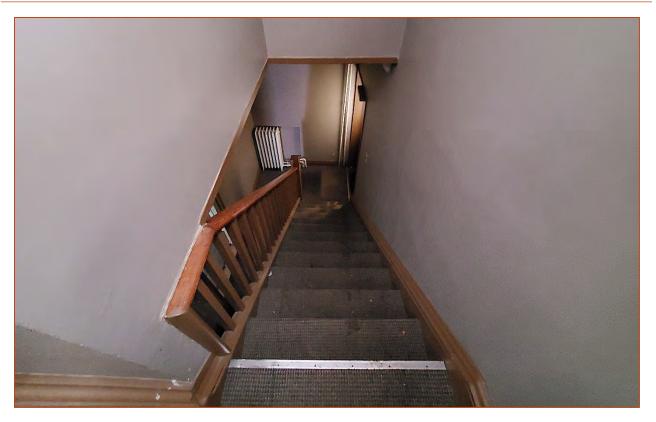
View northeast showing the lower section of the "L" shaped stairway
